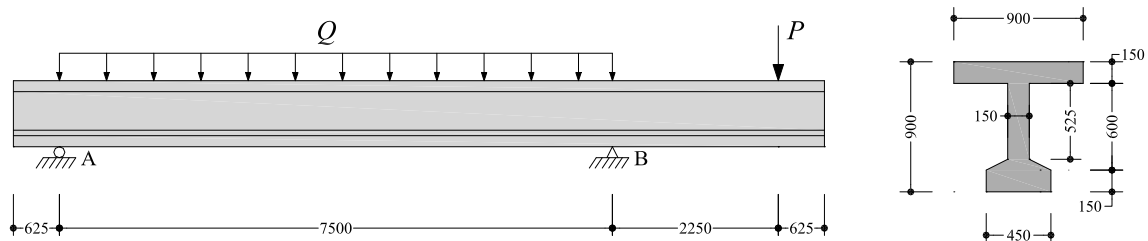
Beam CM2 tested by Cerruti and Marti [53]. Dimensions in mm.
